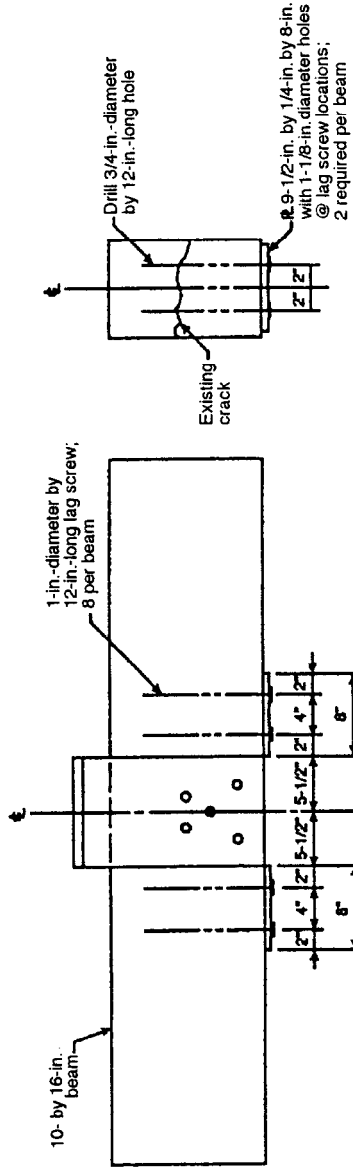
Repair Method 4: Continuous steel plates and 8 1-in.-diameter lag screws (1 in. = 25.4 mm).
